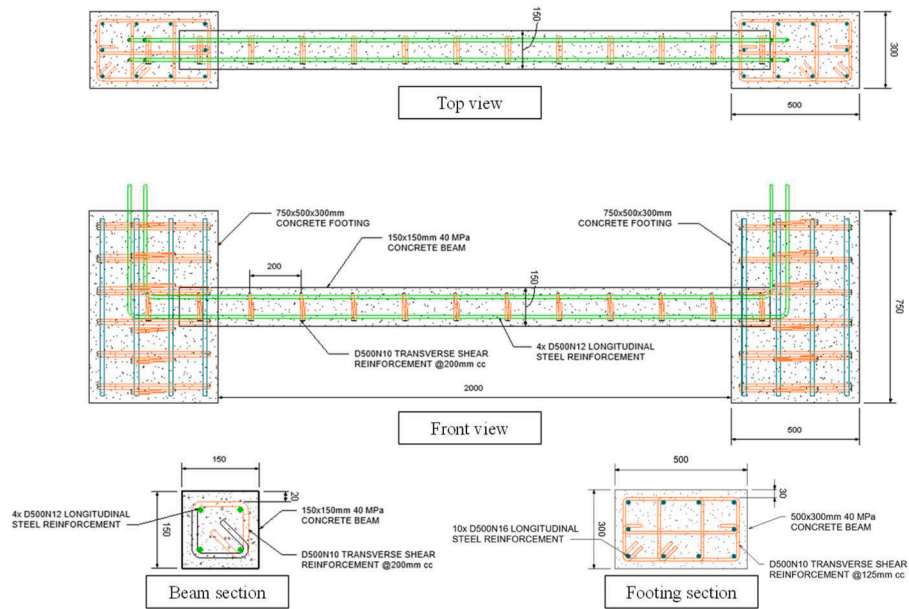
Geometry and reinforcement arrangement of concrete beam specimens (unit: mm).
